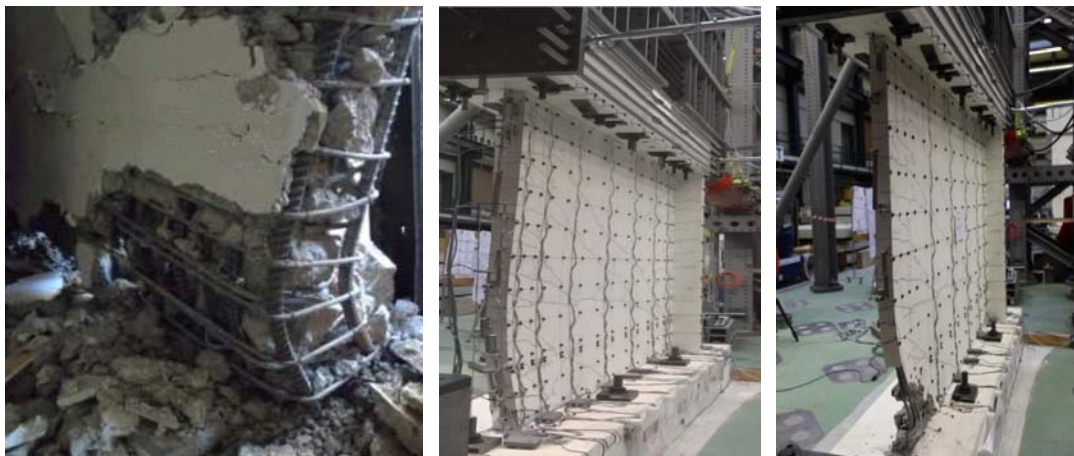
Examples of out-of-plane induced damage in a RC wall after New Zealand earthquakes (Sritharan et al. 2014, left). Test on a thin wall with a single layer of vertical and horizontal reinforcement (Rosso et al., 2015): Deformed shape of around zero in-plane drift (centre) and at the end of the test, after failure (right).
